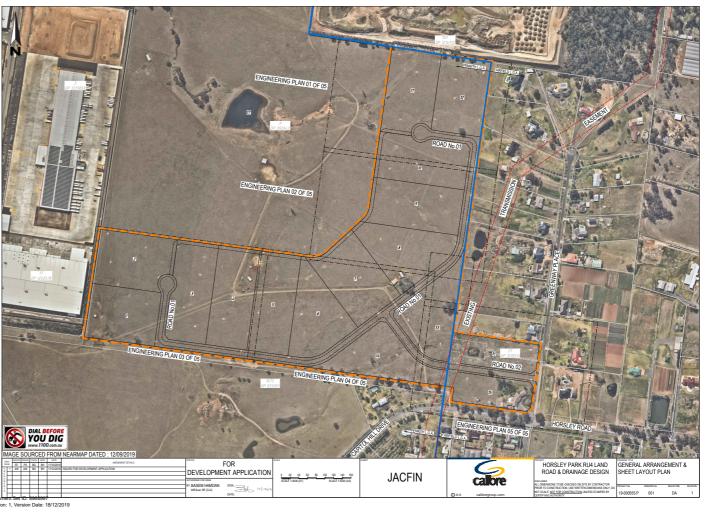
Jacfin Horsley Park Project - Horsley Park RU4 Land Road & Drainage Design (Source: Calibre)
